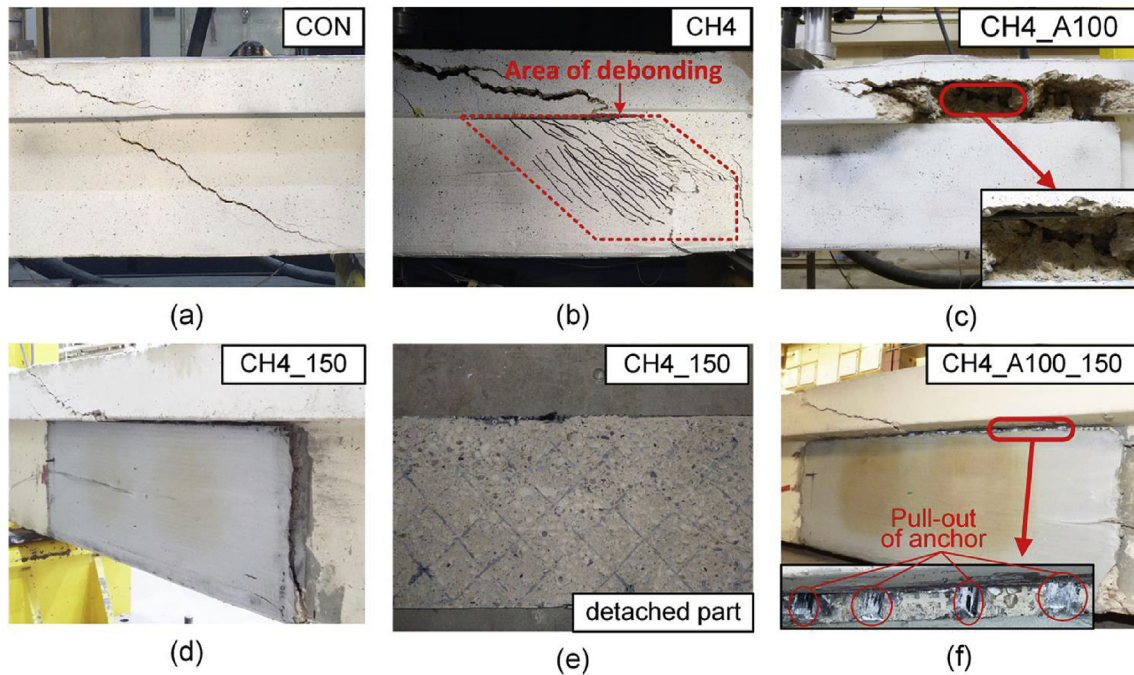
Failure modes of full-scale T-beams: (a) Dominant shear crack in the control beam; (b) specimen CH4 – debonding of the TRM jacket: peeling off of the concrete cover; (c) failure of specimen CH4_A100 due to concrete splitting in the slab; (d) debonding of the TRM jacket in specimen CH4_150: peeling off of the concrete cover; (e) specimen CH4_150 – detached part of TRM jacket including concrete cover; (f) specimen CH4_A100_150 – pull-out of all anchors due to bond adhesive failure.
